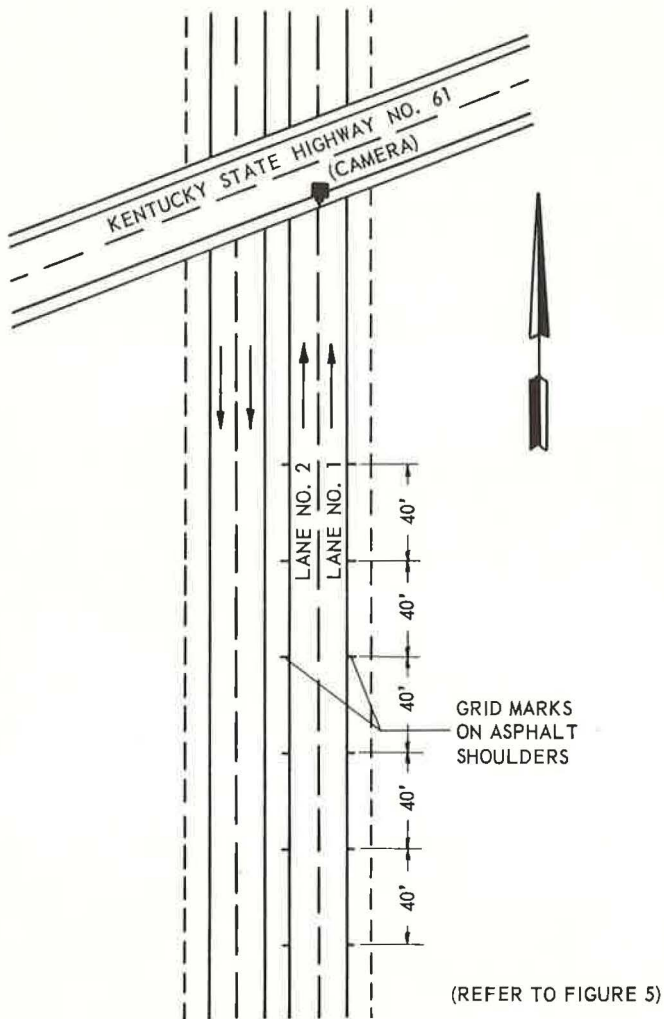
Typical camera and grid layout, scale: 1 in. = 60 ft.
